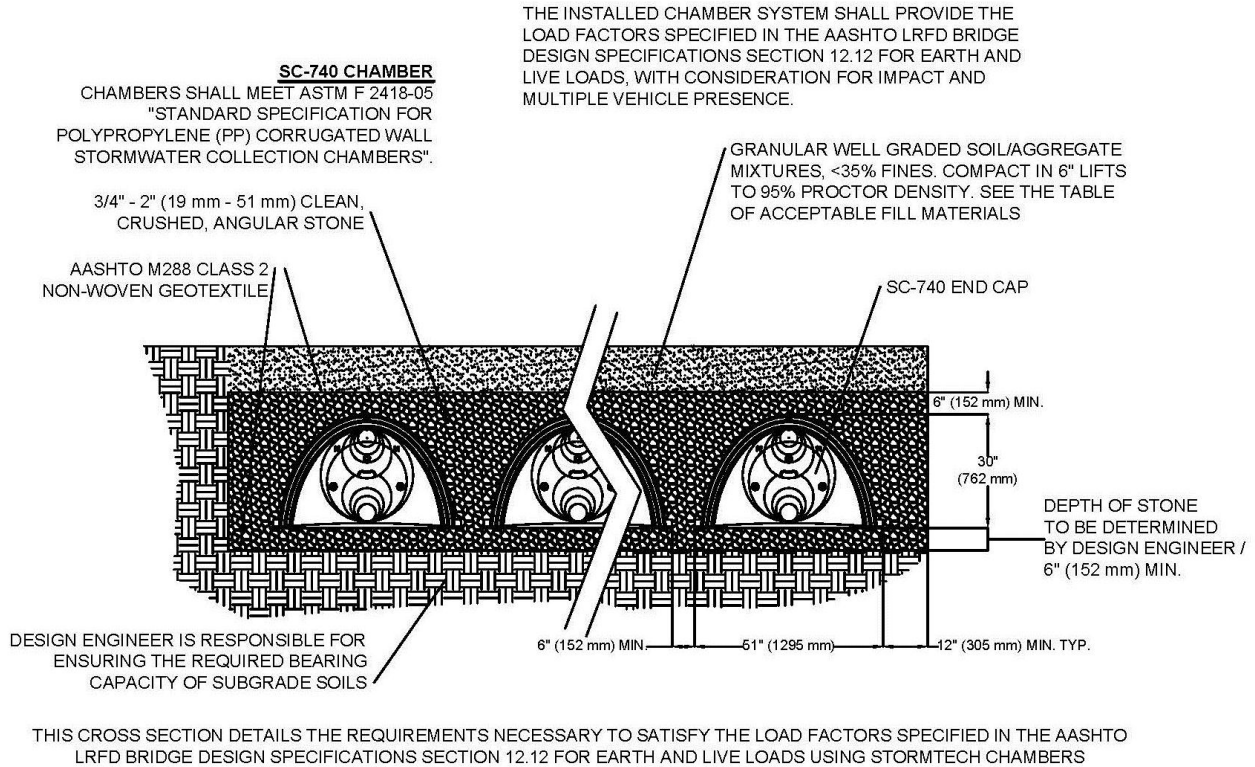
and Figure 10 show the cross sectional views of the infiltration trenches. These trenches are composed of the infiltration chamber that sits on top of 6 inches of stone, and covered to the top with six inches of stone. All of the stone is surrounded by a non-woven geotextile fabric to reduce the amount of outside dirt from entering the stone. The system is then covered with four to 18 inches of acceptable fill materials.
